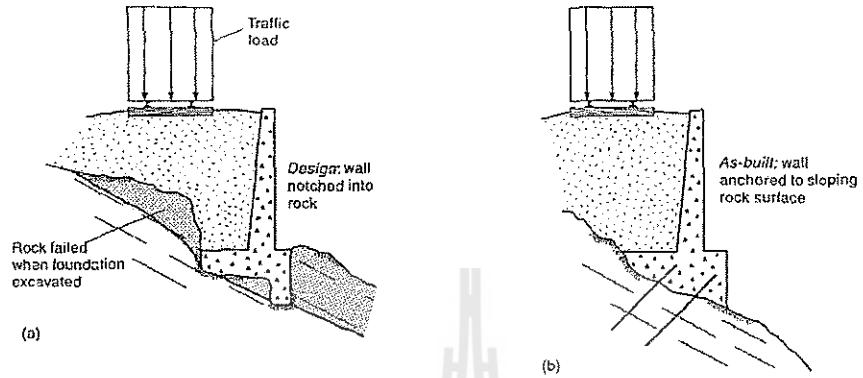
Construction of rock foundation: (a) attempted 'sculpting' of rock foundation to form shear keys; and (b) 'as-built' condition with footing located on surface formed by joints.
